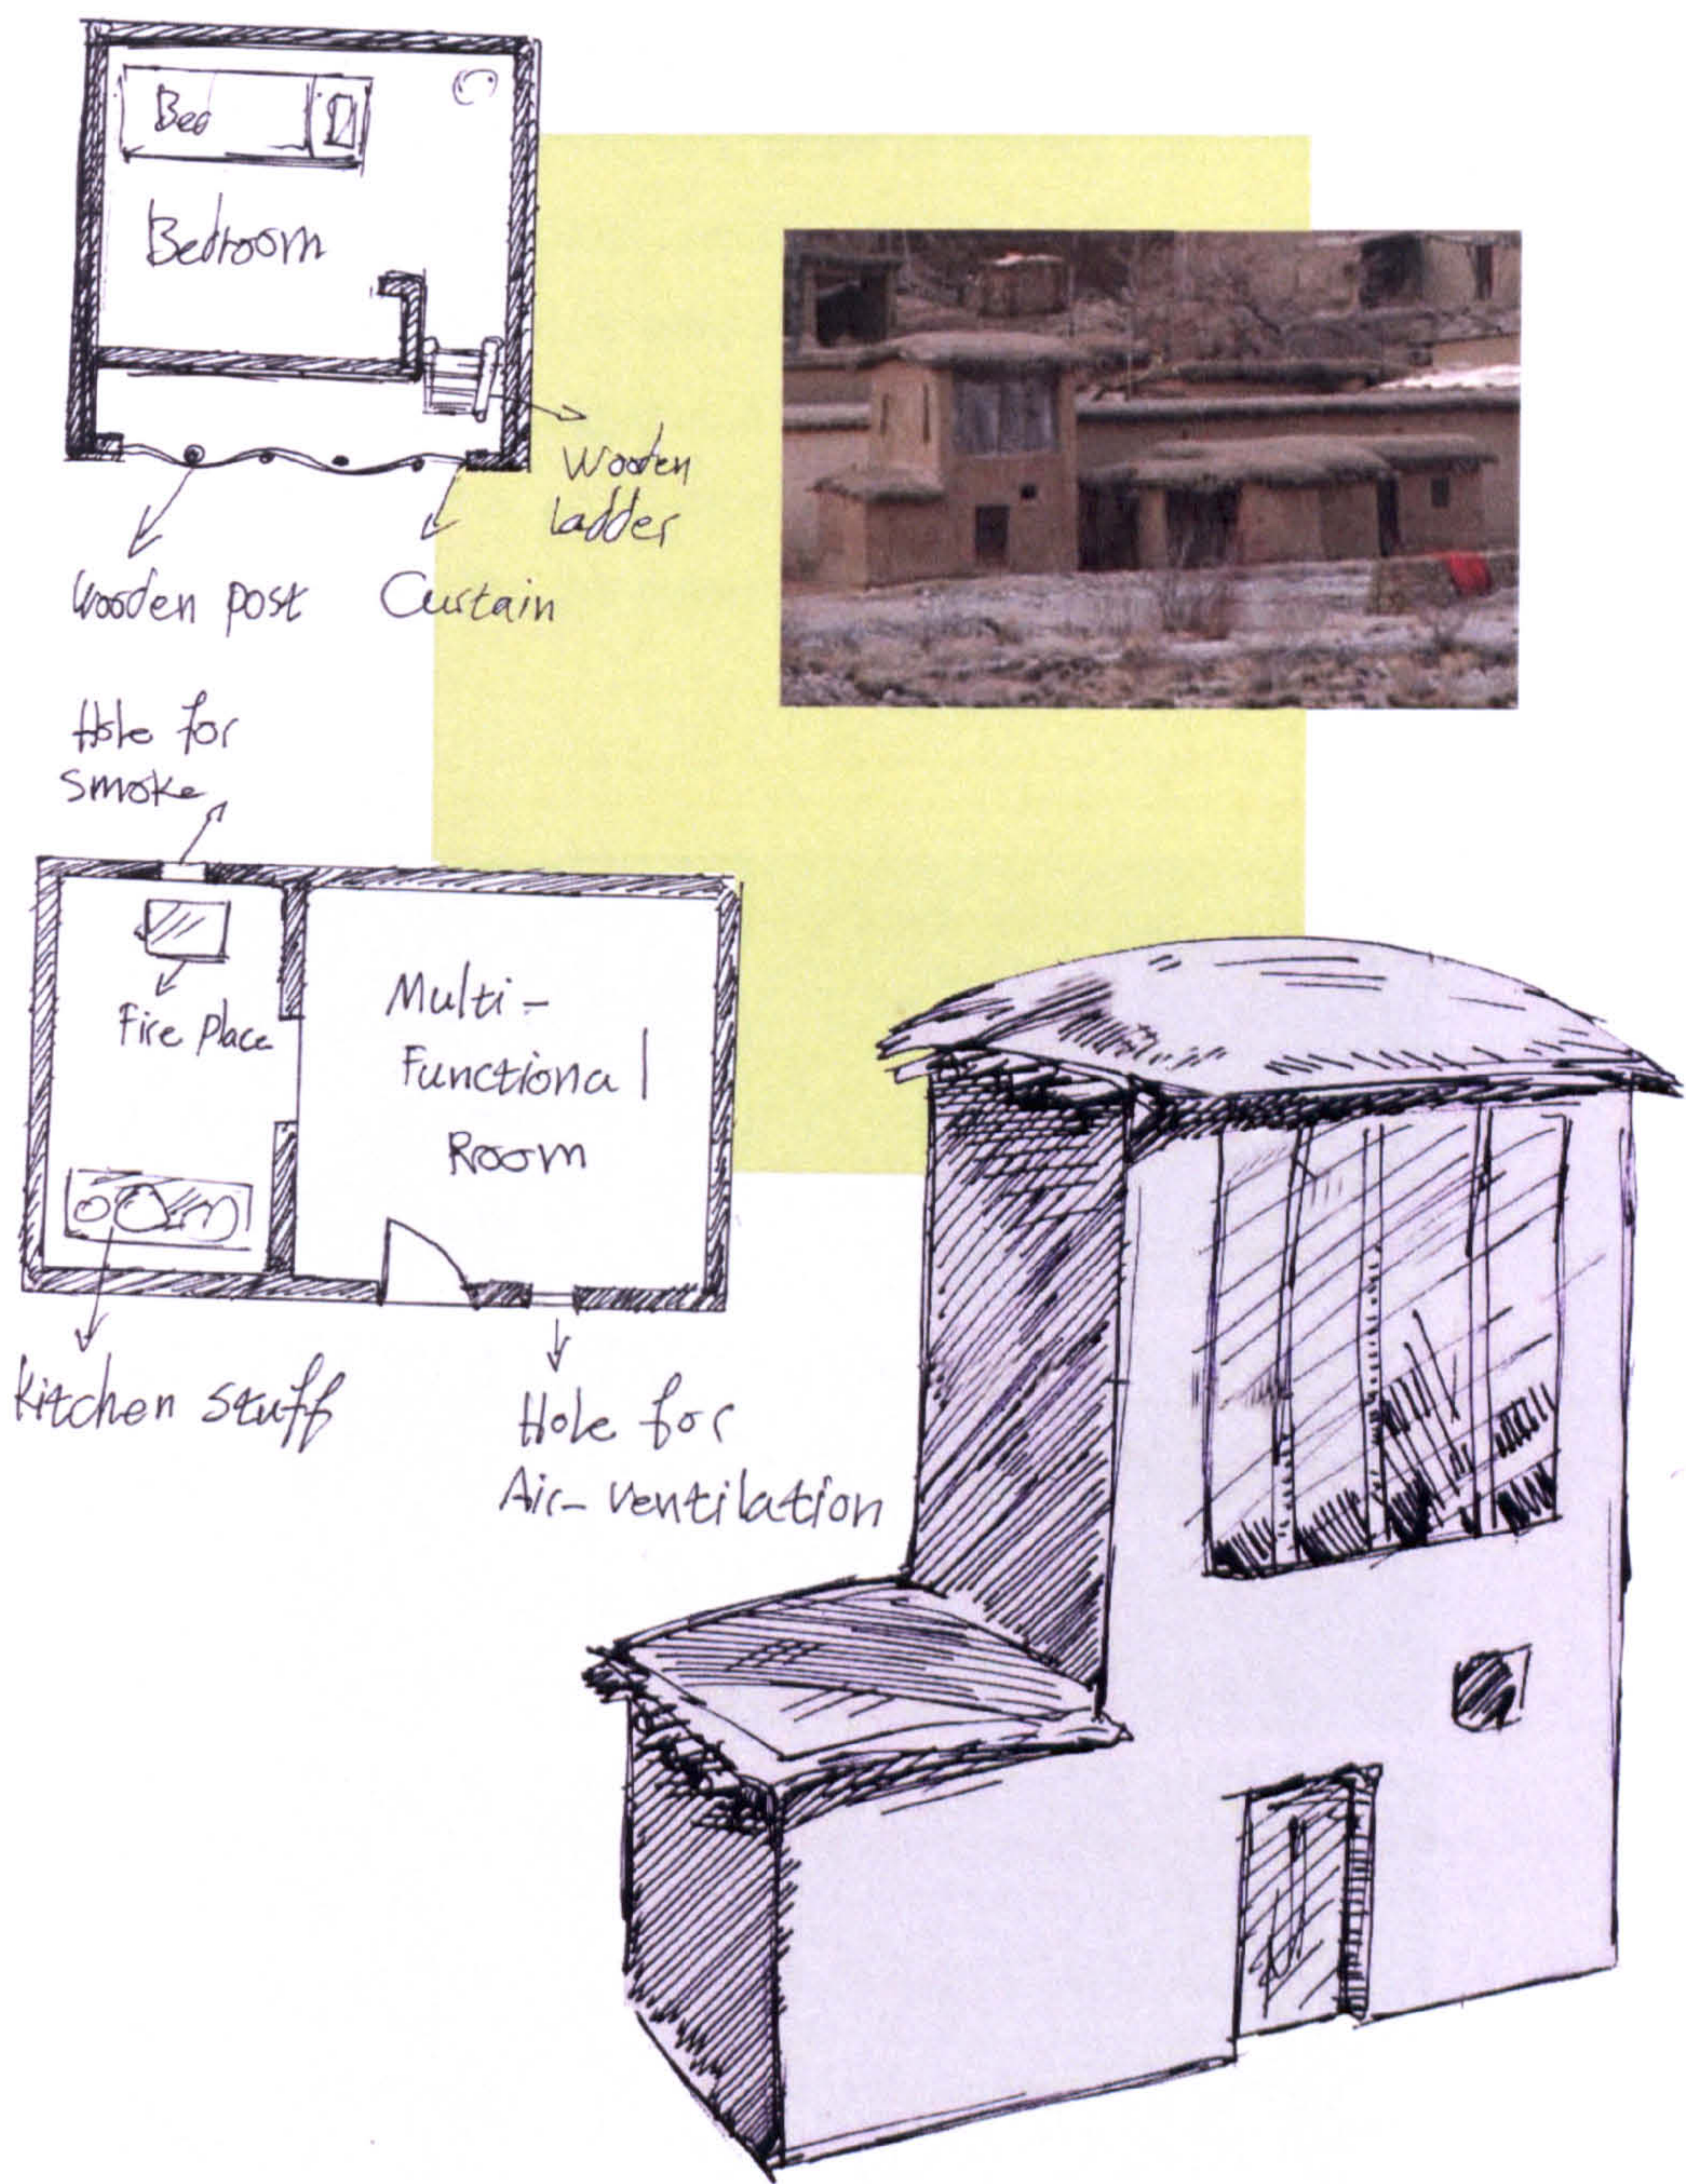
Illustration of another two storey house in Ziyarat in Baluchistan. The first floor of this typical house contains a storage room/kitchen and a multi-functional room which is used for sitting, sleeping and serving food. The second floor is used mainly for sleeping and receiving guests. The large window in the upper part of building is made of bamboo posts and is covered with plastic sheeting. Both the kitchen and multi-functional room have a hole for ventilation. Source: Author
